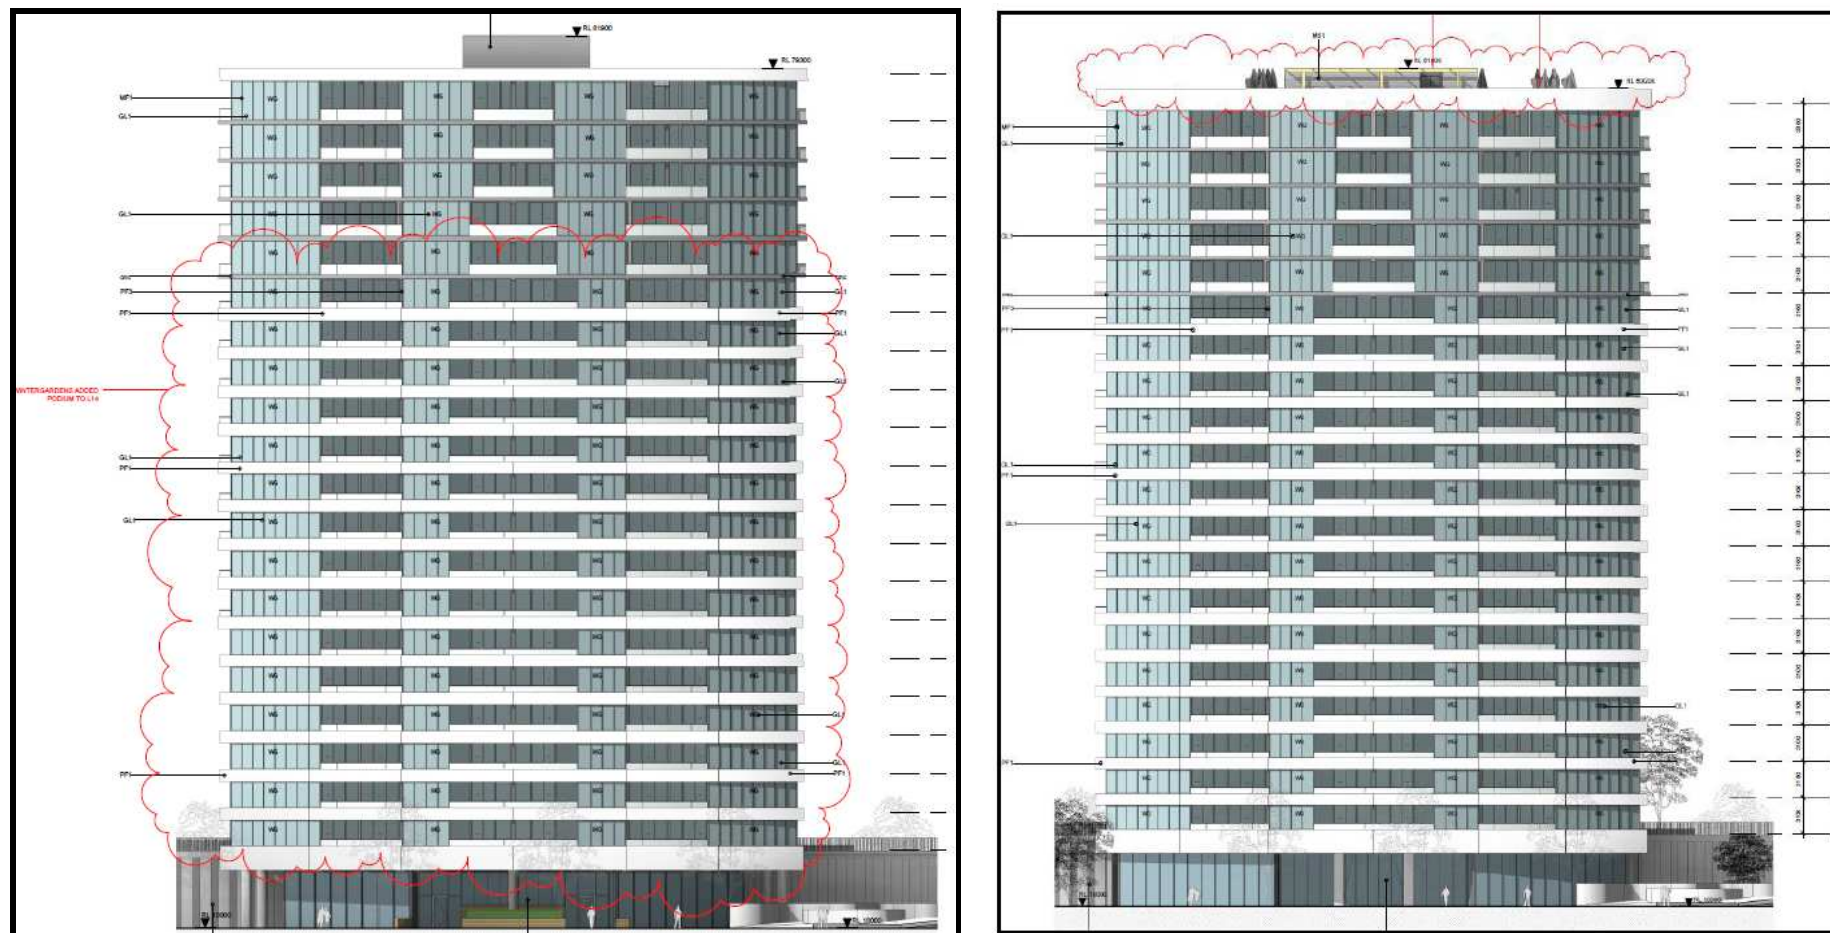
Approved (MOD 3) and proposed western elevation (Source: Proponent's application)
